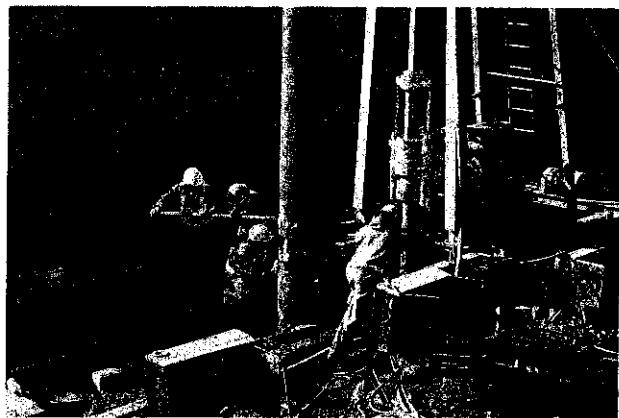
Landslide control steel pipe pile with screw joint (mecha-neji)
